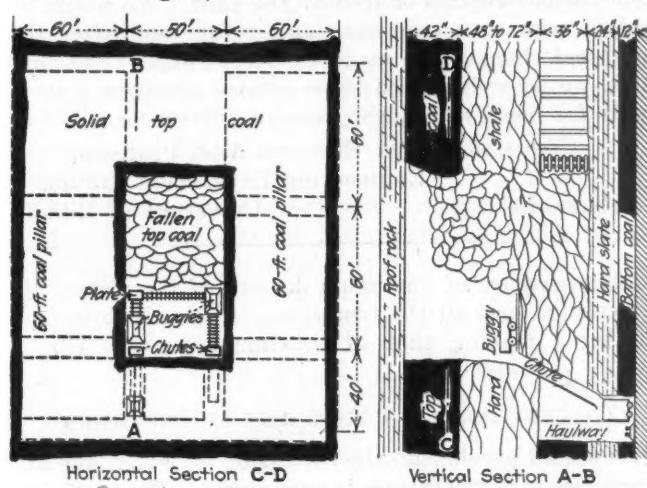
PLAN AND ELEVATION WORKING OUT TOP COAL
